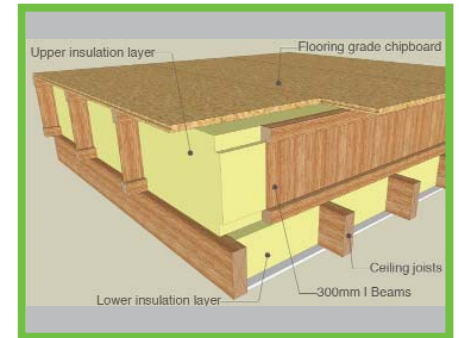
Storage platform raised on timbers to create more space for insulation underneath
